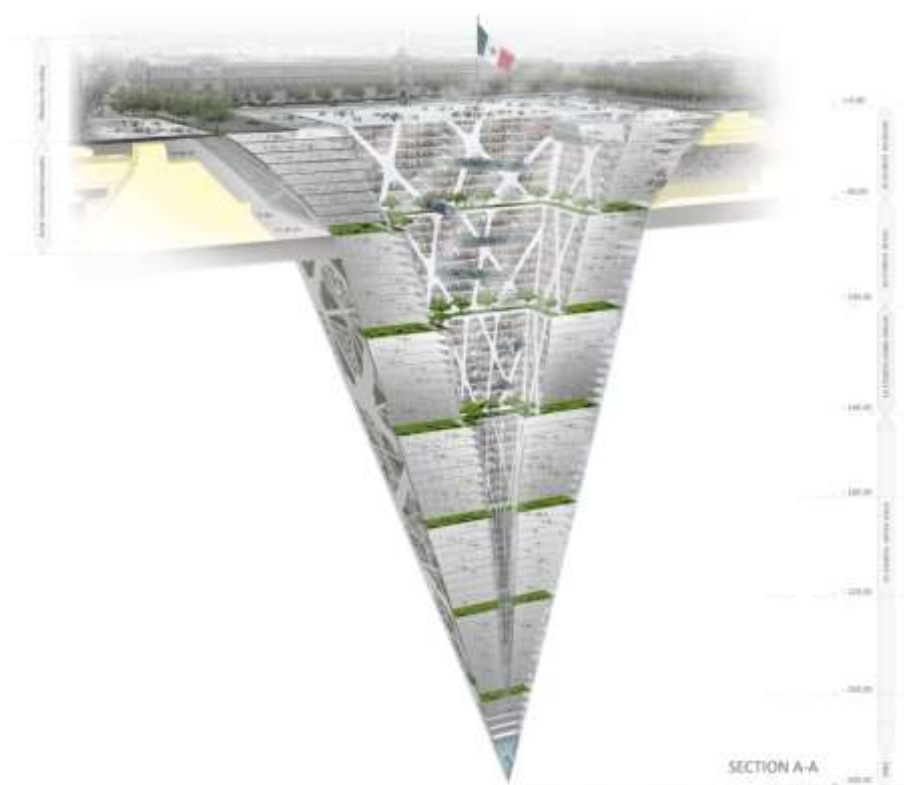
Mexico City's proposed 75 storey underground scraper by BNKR Arquitectura illustrates a vision for underground buildings in the future. (With kind permission from BNKR Arquitectura).
